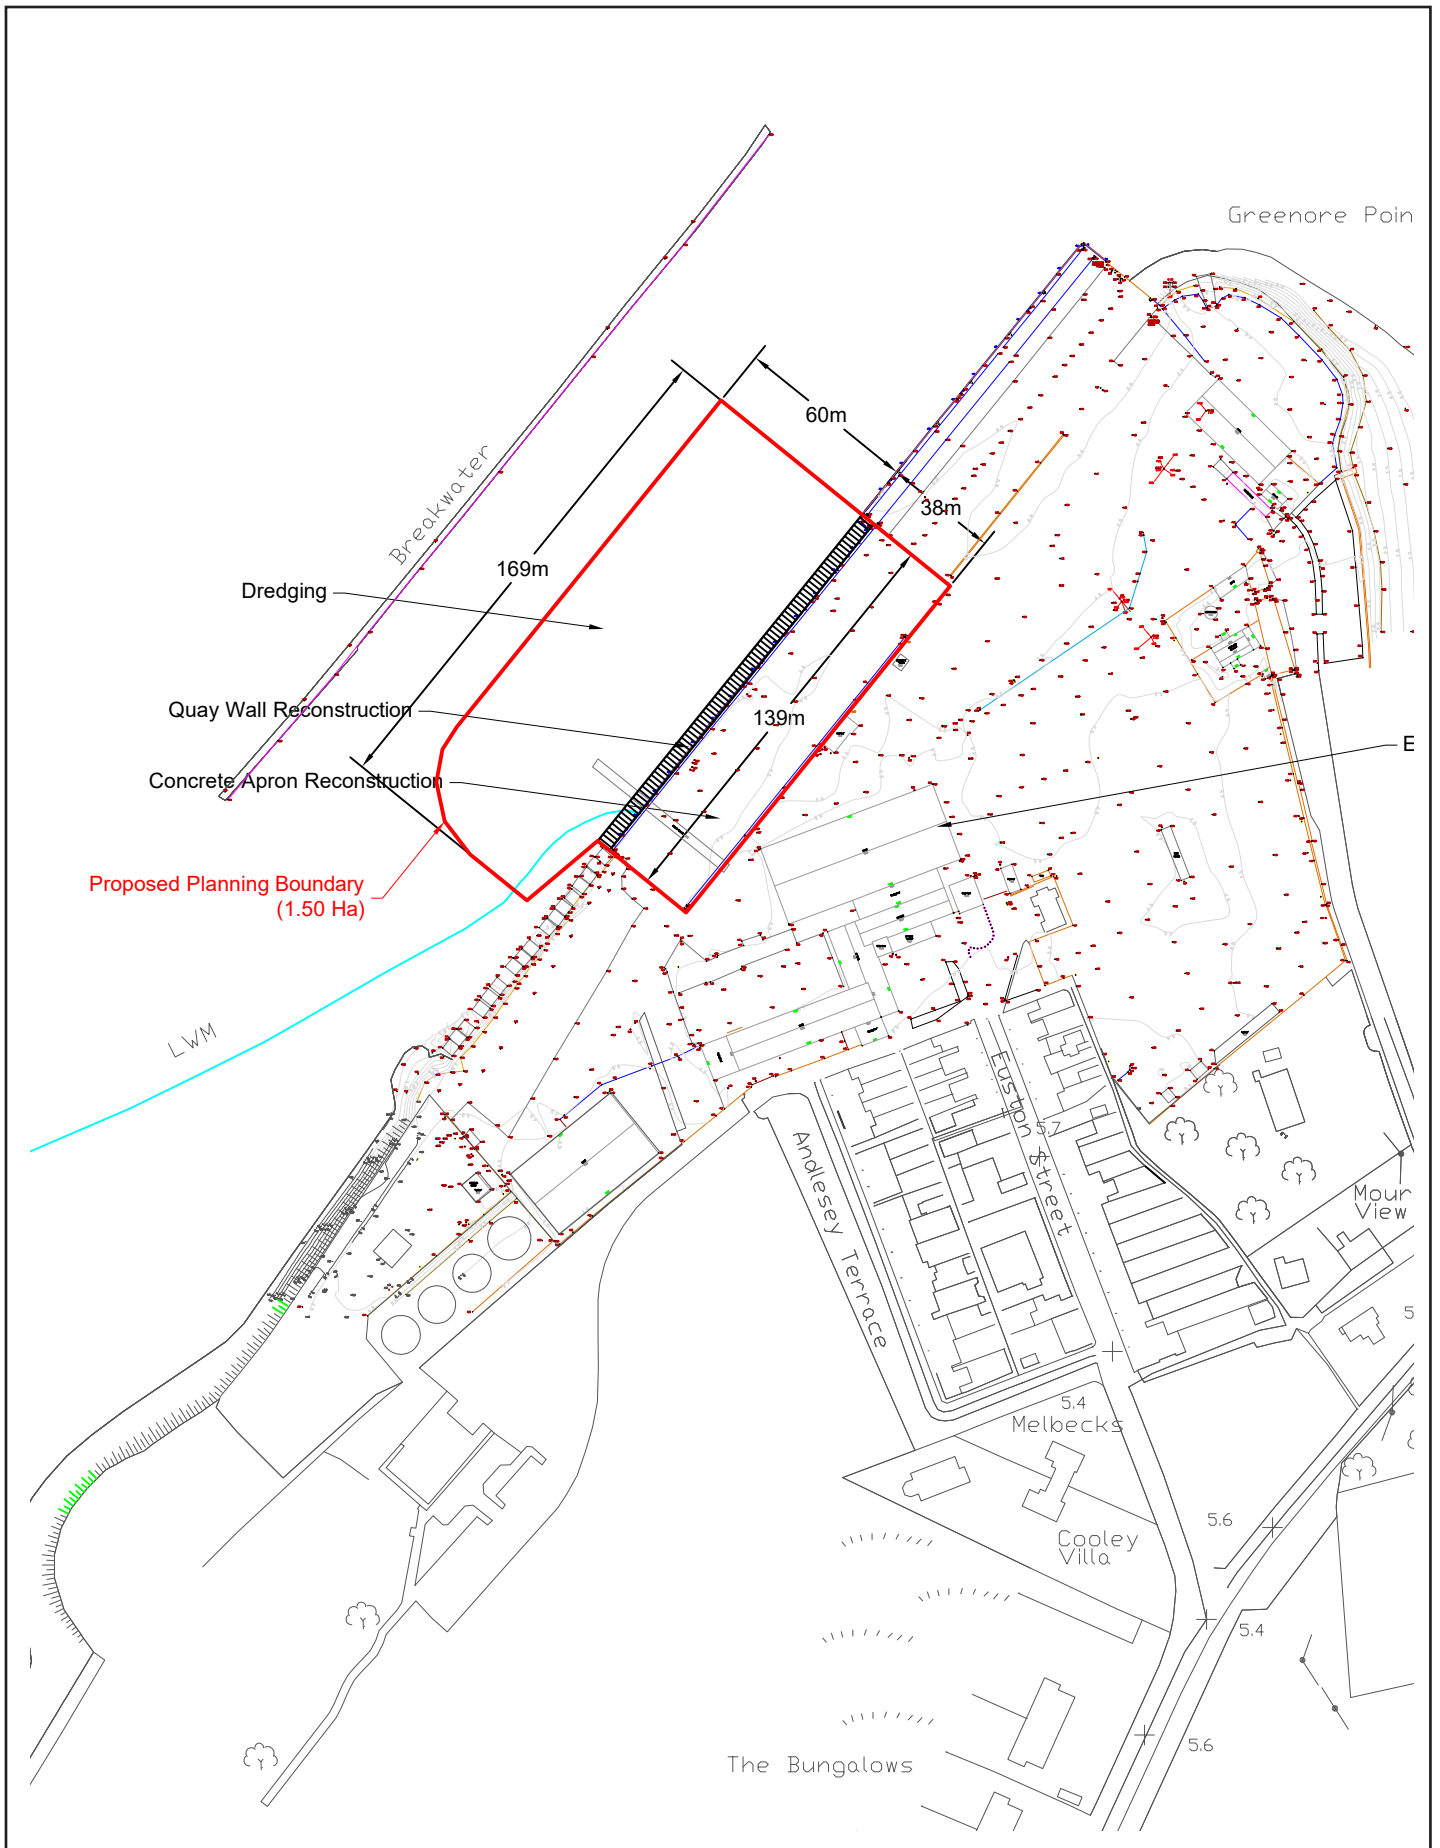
Detail from Project Drawing C983/PP/1 Layout Plan, showing proposed development.
